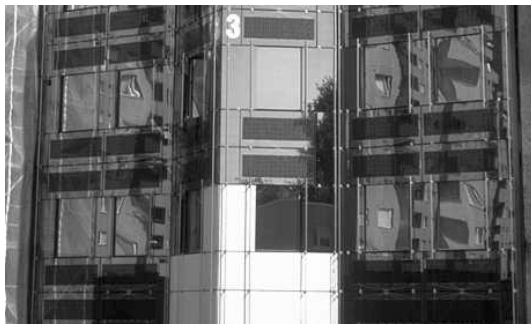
PV-Cladding, 4,2kWp, Ökotech 3, Berlin
